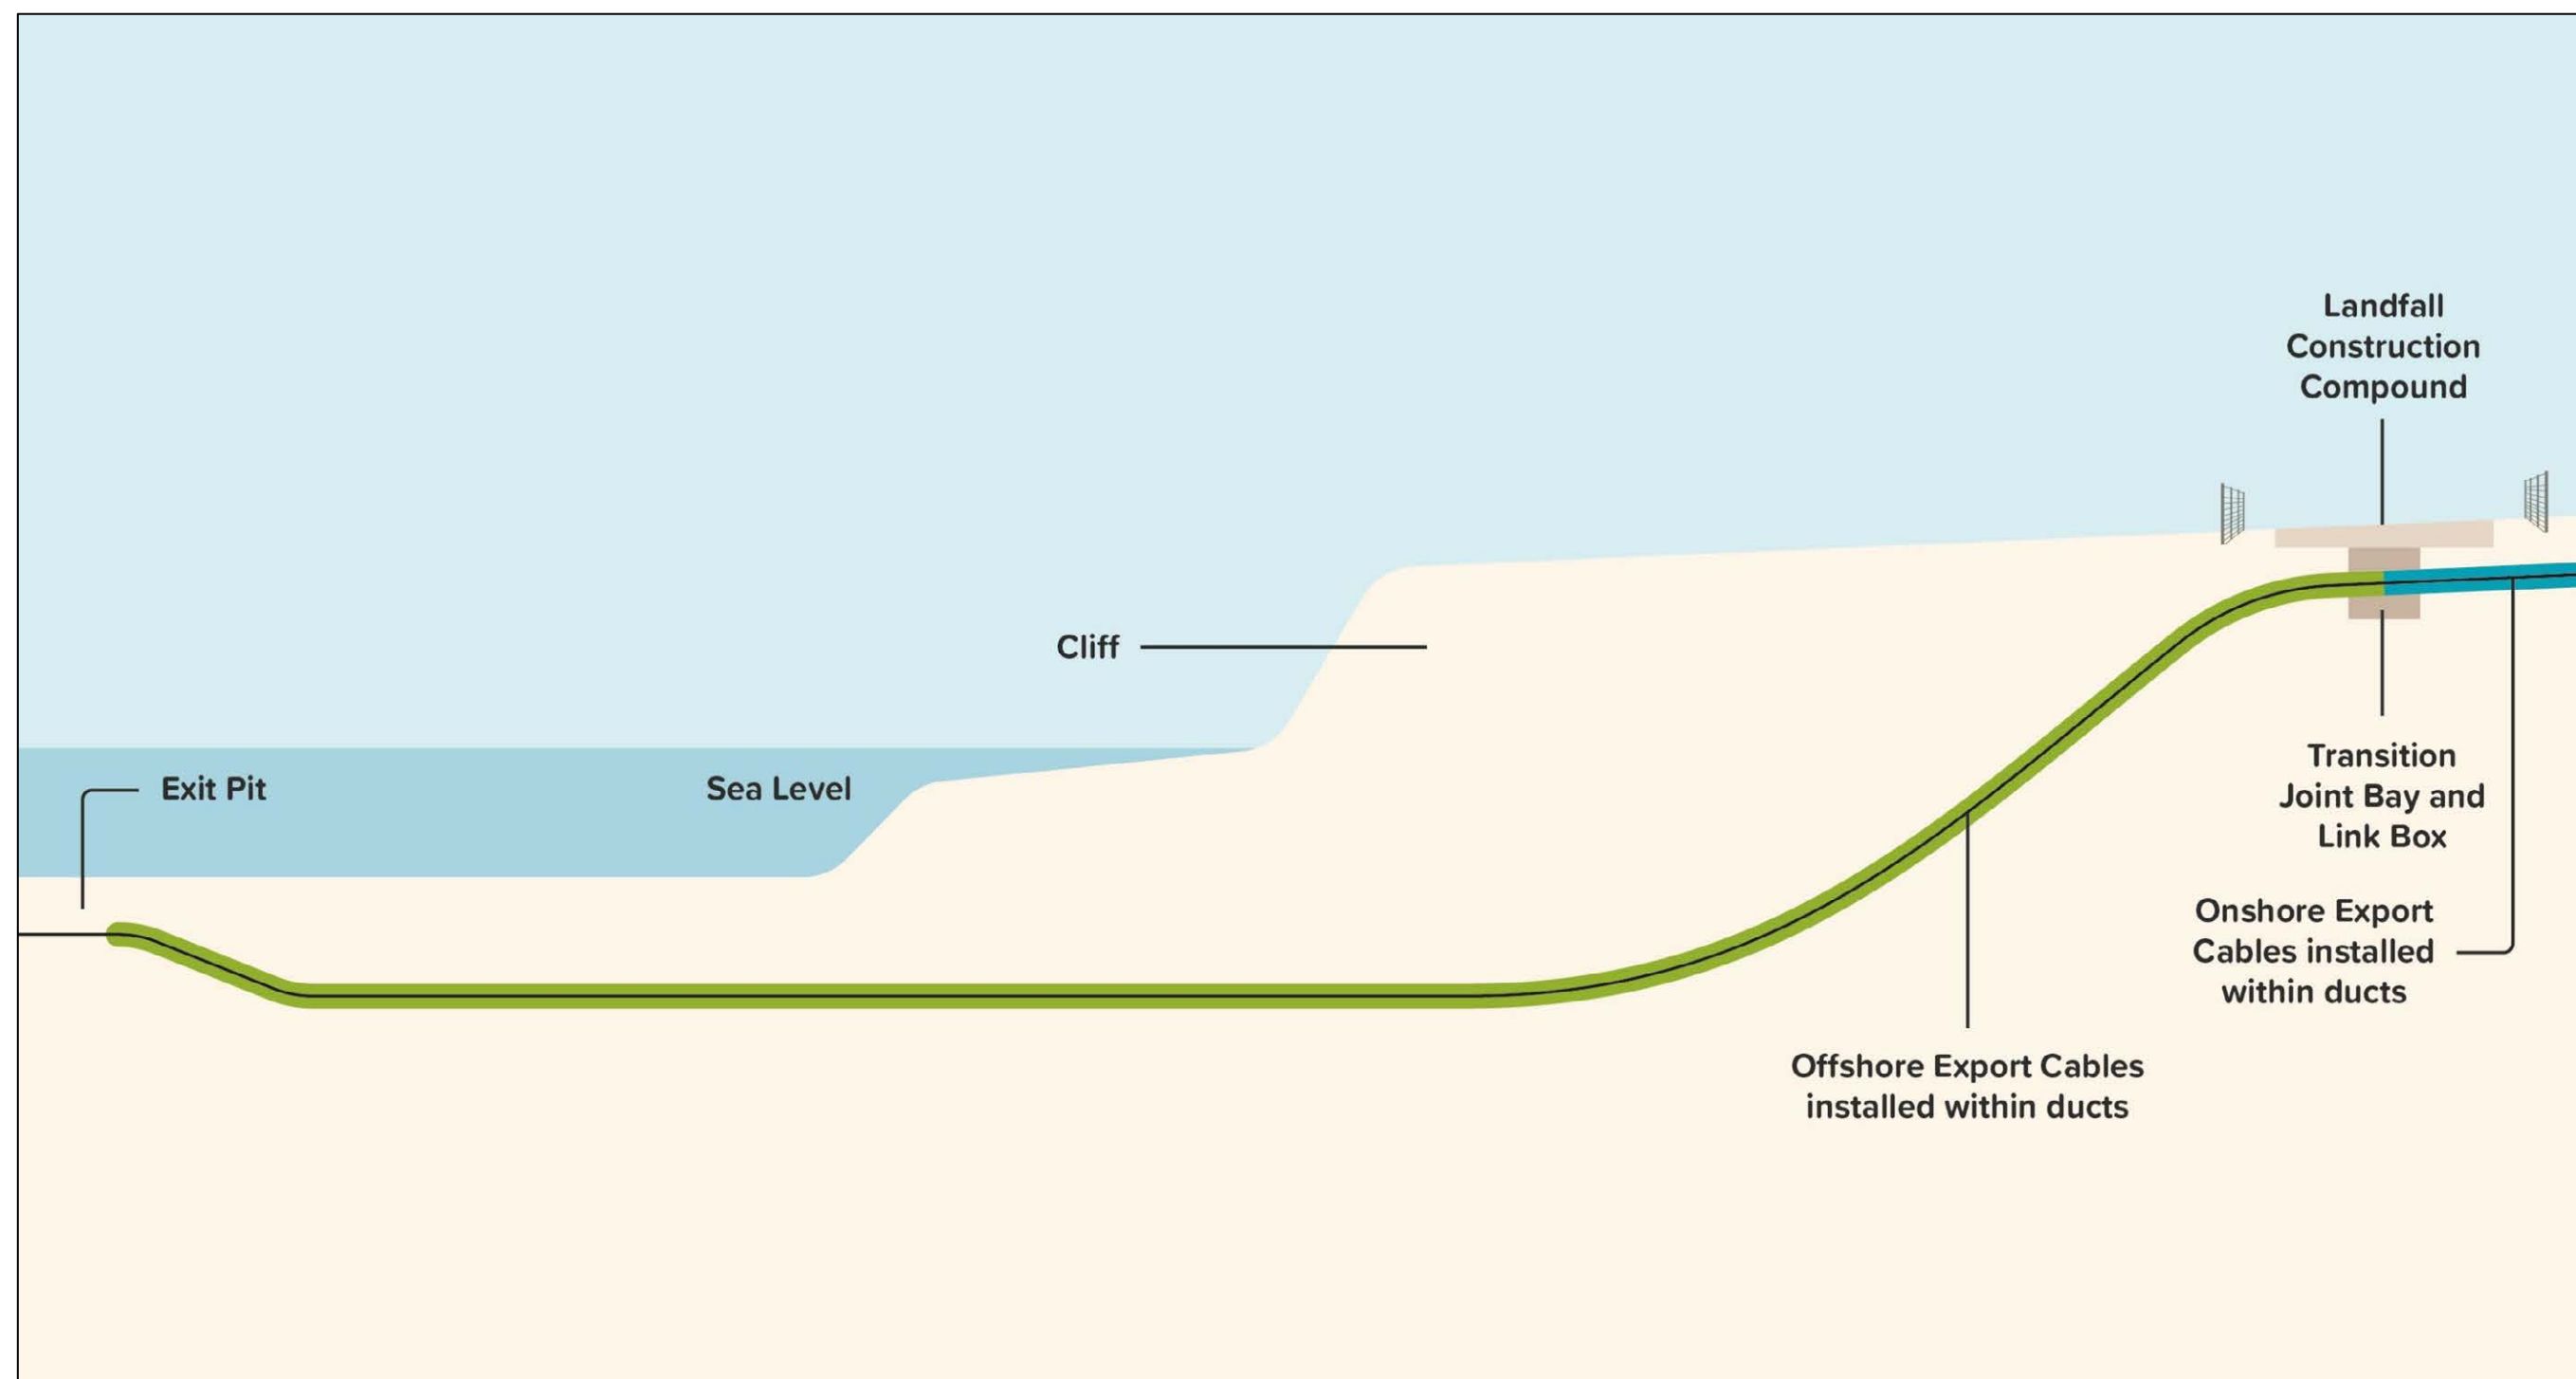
Indicative Cross-Section of Landfall Trenchless Installation Works
